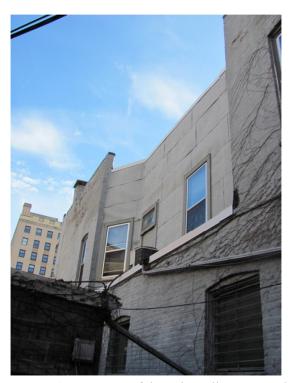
A portion of the side wall is recessed at the second floor and is clad with painted sheet metal.
